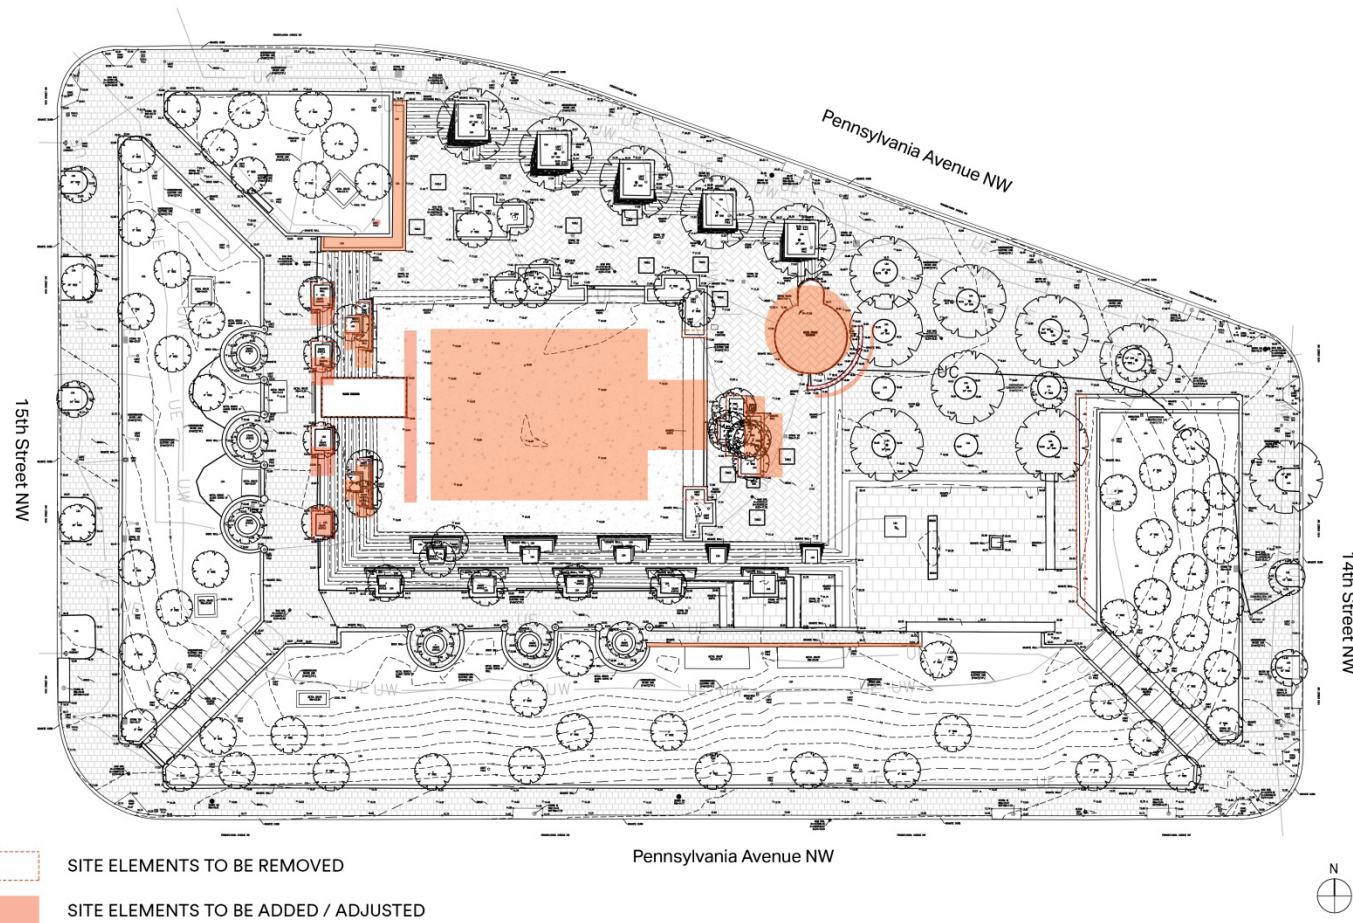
Alternative B: Freestanding Sculpture with Island Walkway Structural Changes to Pershing Park Site
